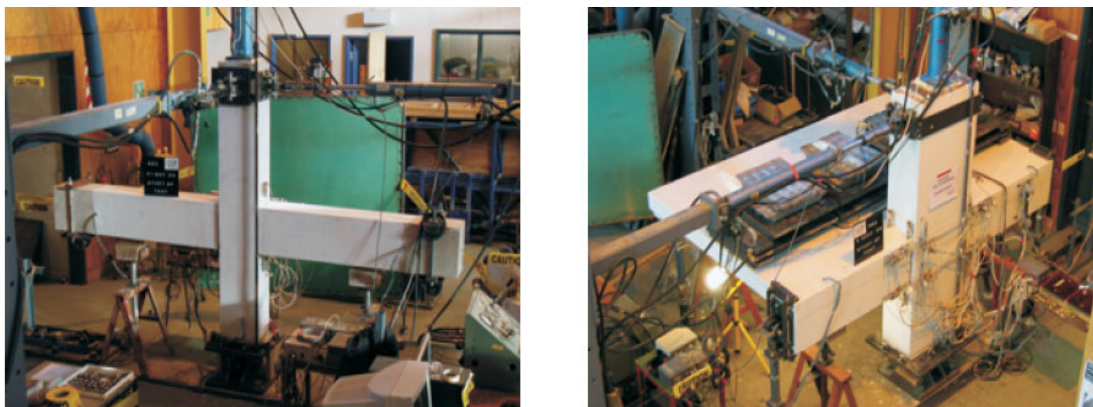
Experimental tests on beam-column connections using slotted articulated floor proposed in New Zealand. [2.35]
